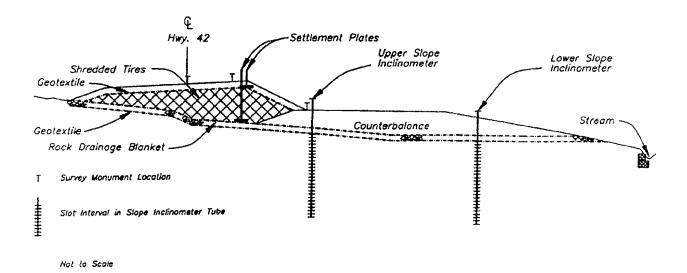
Typical cross section, shredded tire fill site in Washington.⁽³⁸⁾
